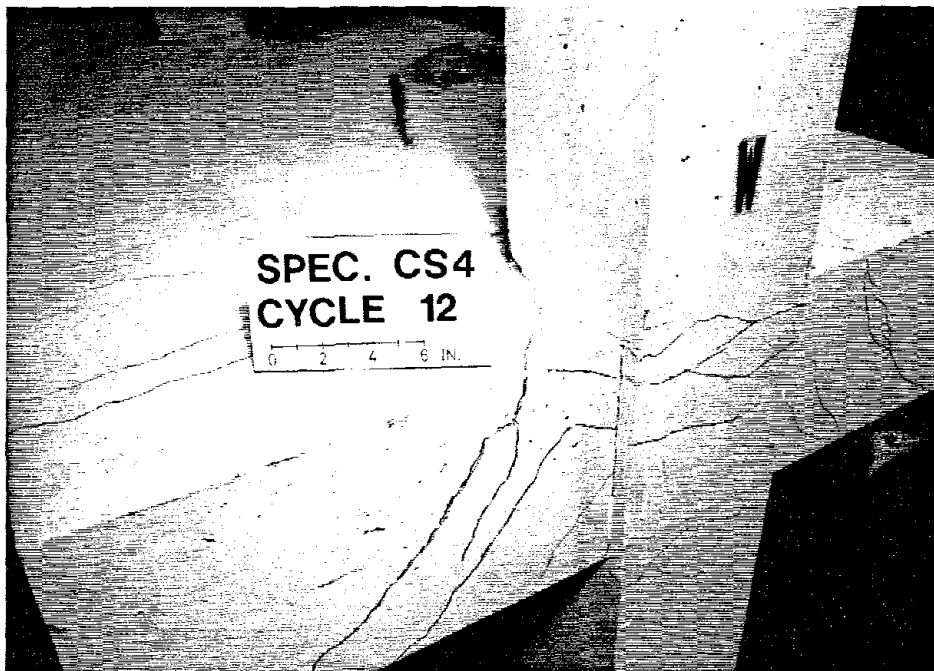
Torsional Cracks in Transverse Beams of Specimen CS4
